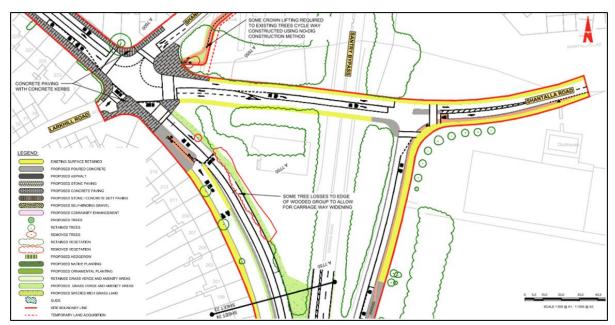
Proposed Landscape General Arrangement at the Slip Road (Sheet 23)
